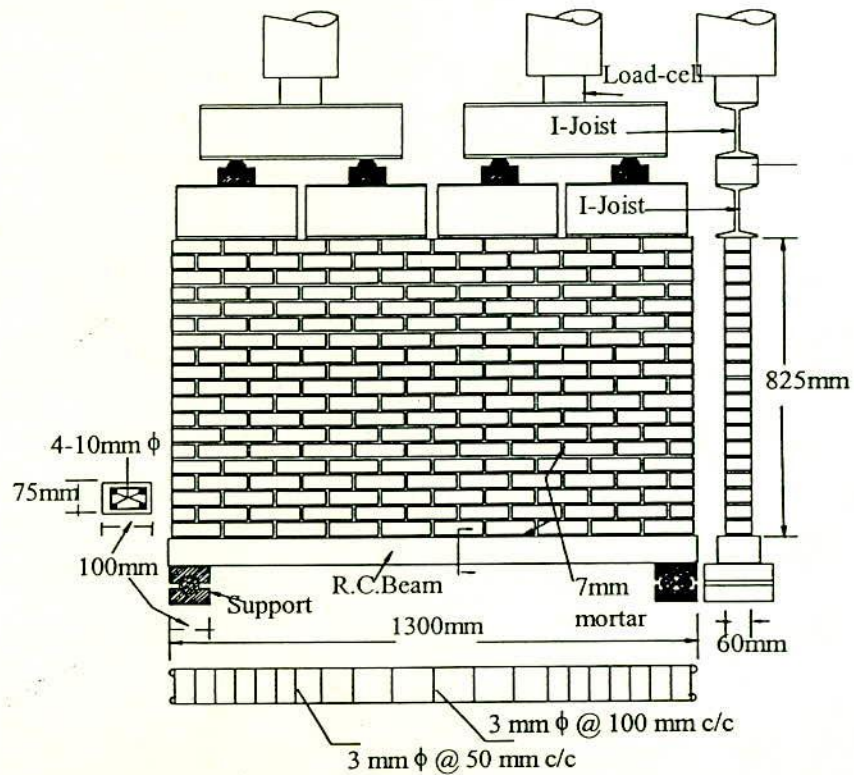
(c) Details of Panel and Testing Arrangement for Plane Wall-beam
